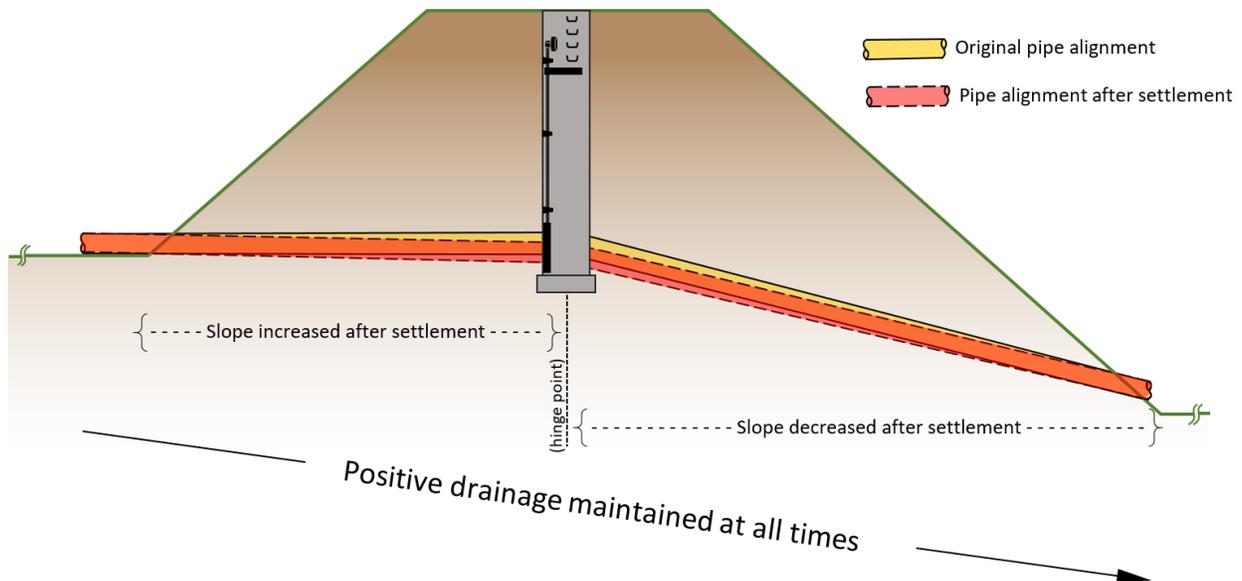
Vertical pipe alignment to compensate for foundation settlement.
